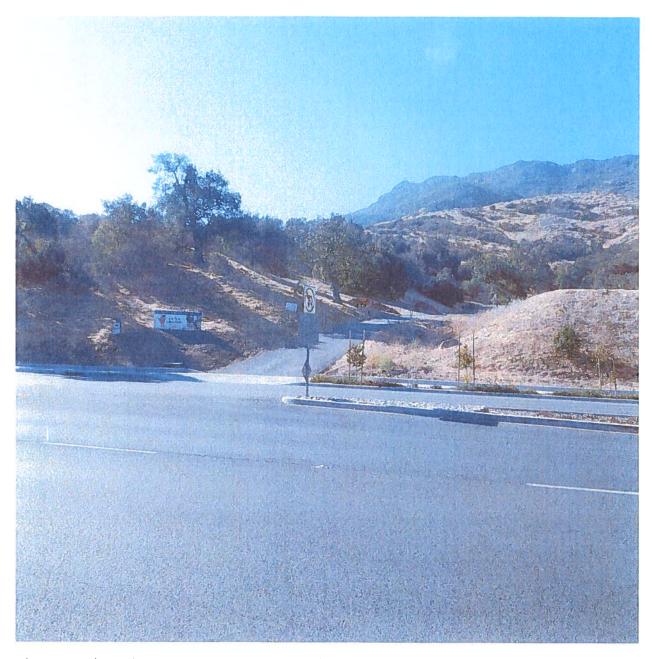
(Northwestern corner of Lot 1) Looking south from Agoura Road at the western end of Lot 1. Lot 1 is to east (left) of driveway.
